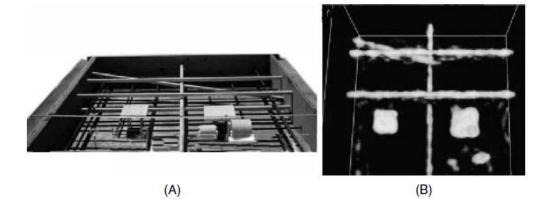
Imaging steel in concrete with MIR: (A) the internal elements of a concrete slab before pouring; (B) reconstructed 3-D MIR image of the elements embedded in the finished 30-cm-thick concrete slab.
